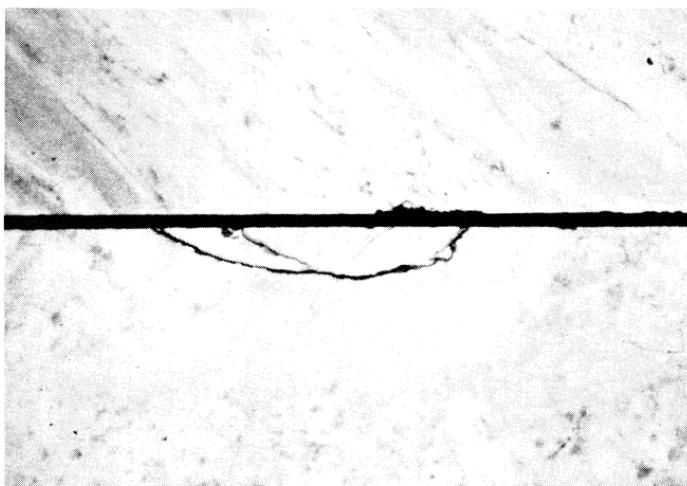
View of typical crescent shaped crack in marble panel at connection.
